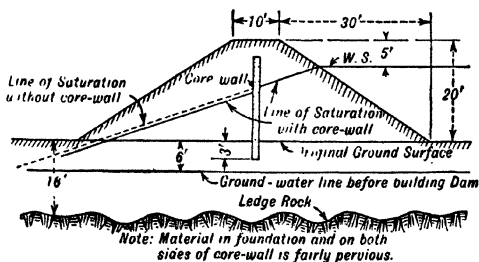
Core-wall in Dam of Pervious Material on Foundation of Similar Material.
